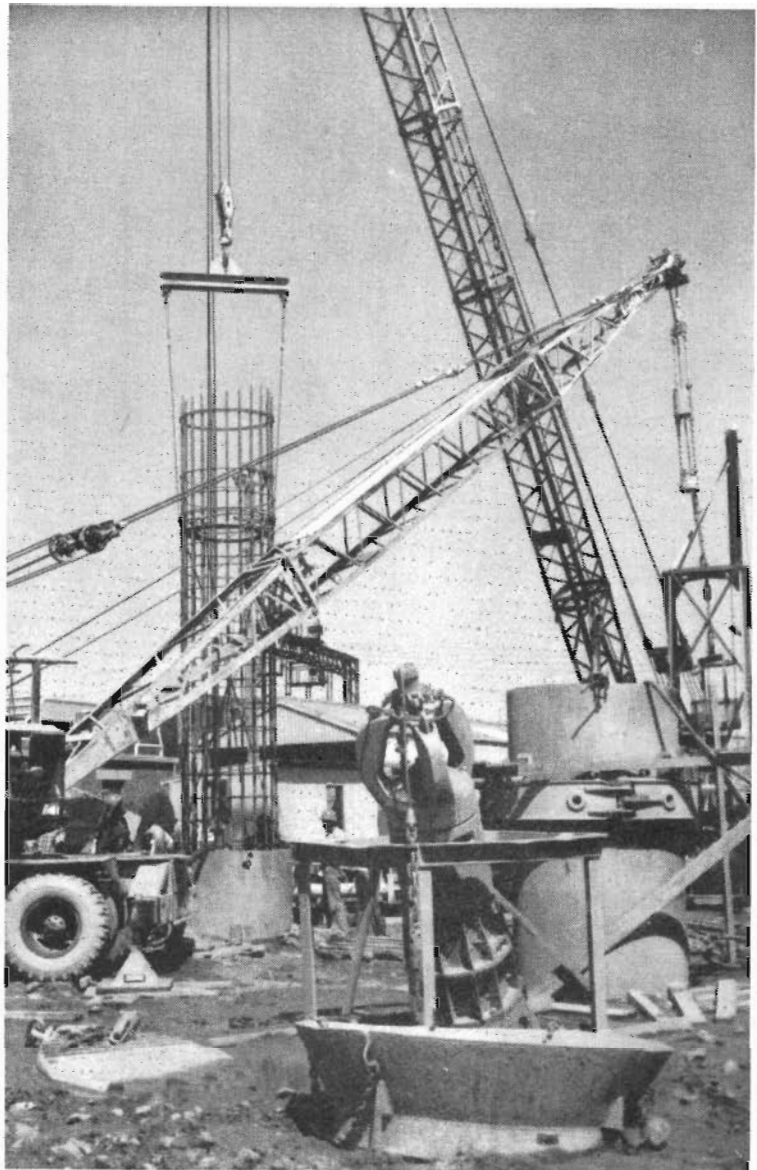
King-street Bridge Project—Cylinders and Benoto Bucket in foreground.
